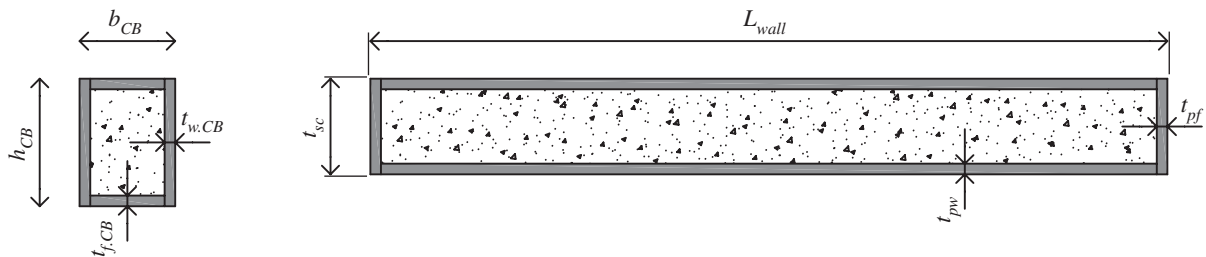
Cross section of coupling beams and C-PSW/CF.
